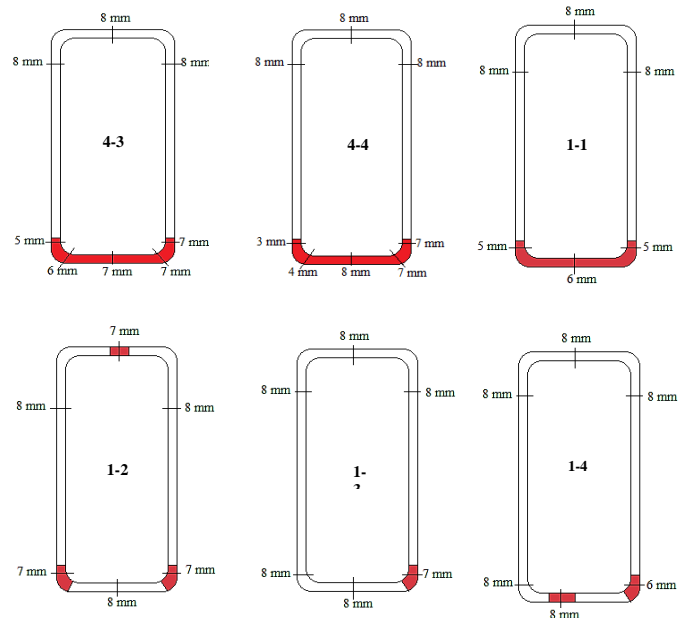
Locations of corrosion in steel stirrups.
